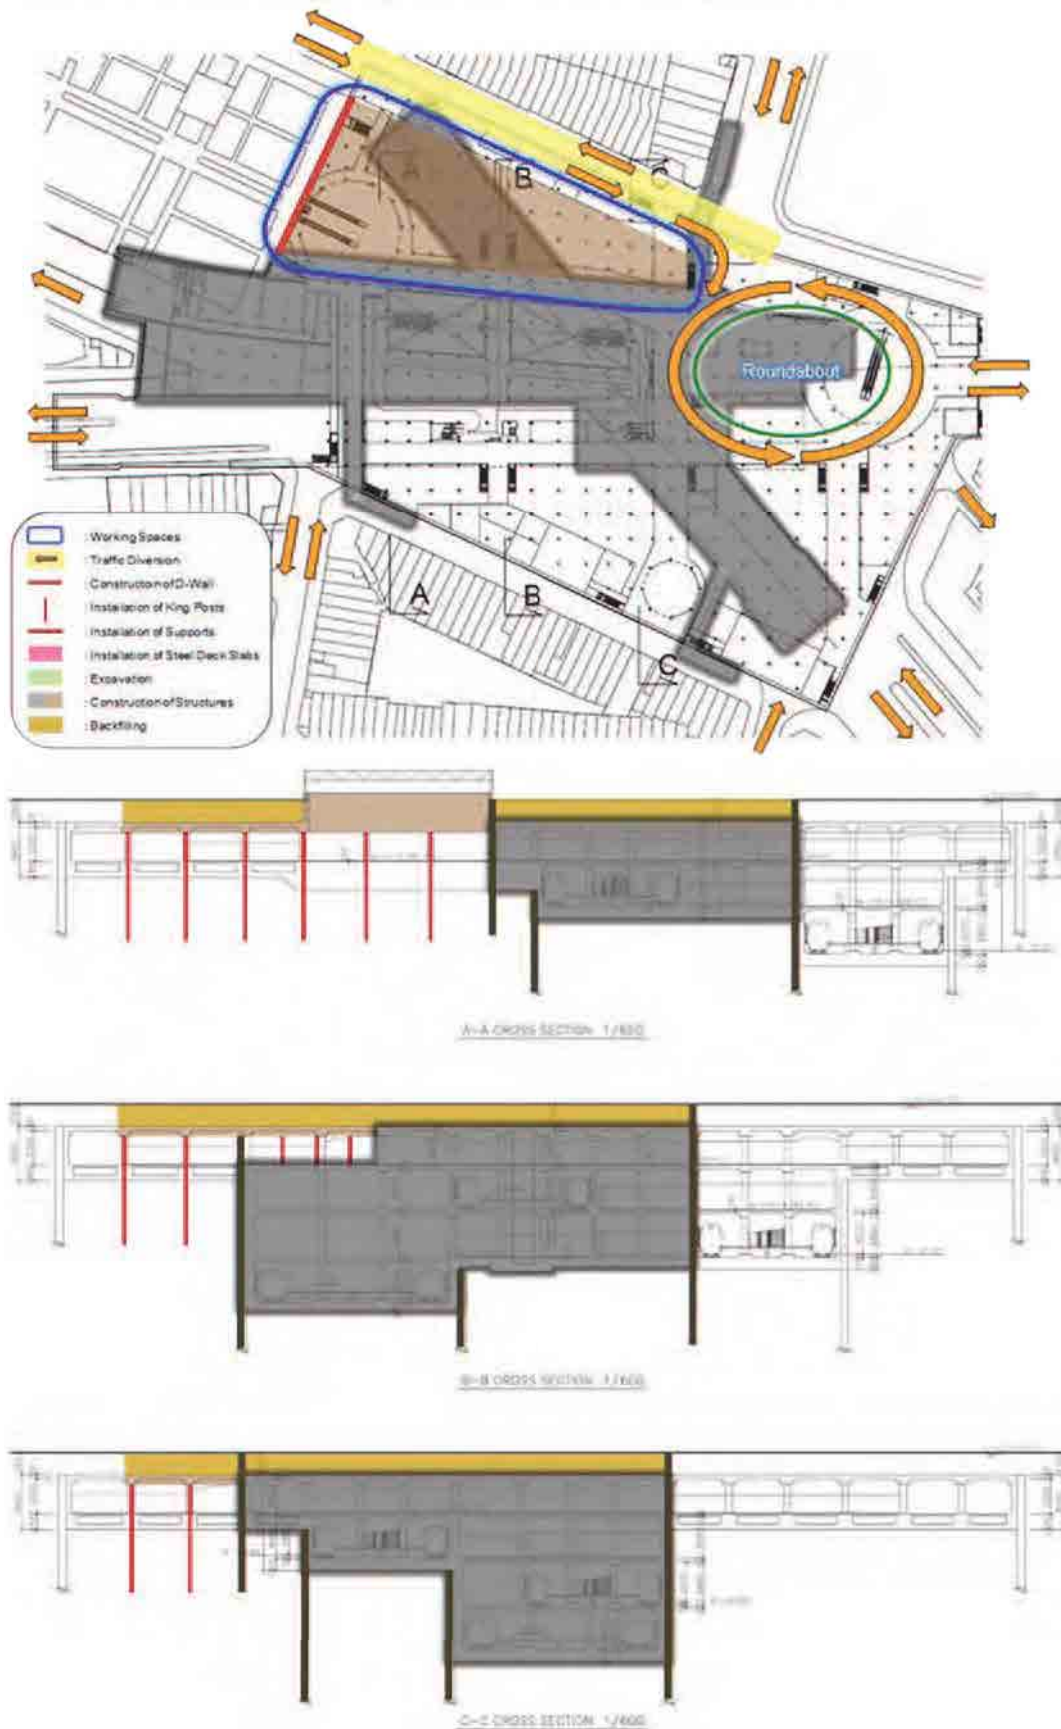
Construction Sequences of Ben Thanh Central Station (12/24)
